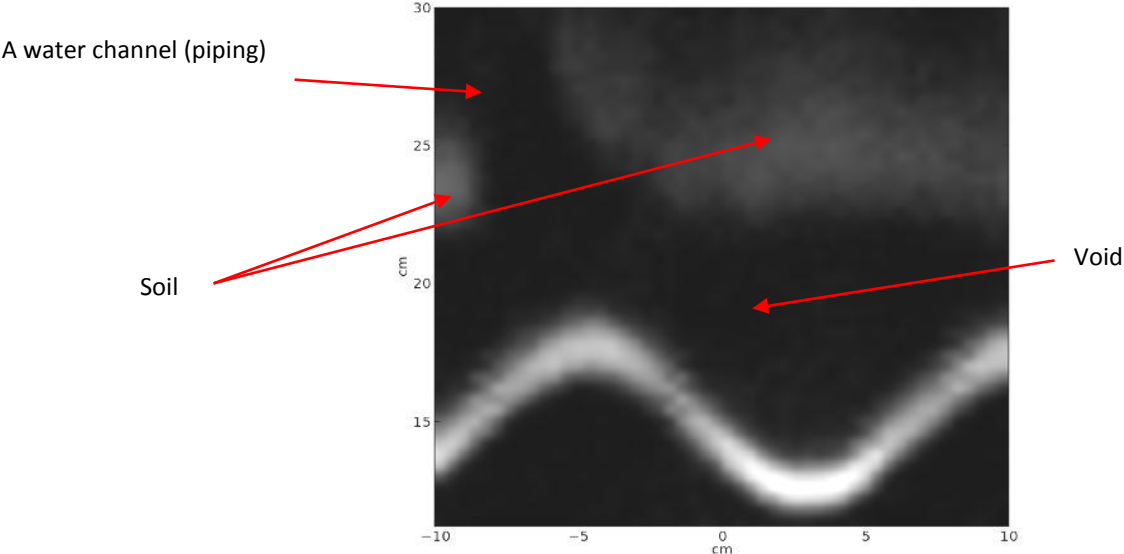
Image B – A follow up BCT image of Acoustic Anomaly #1 indicates significant (up to 15cm) voiding behind the culvert wall.
